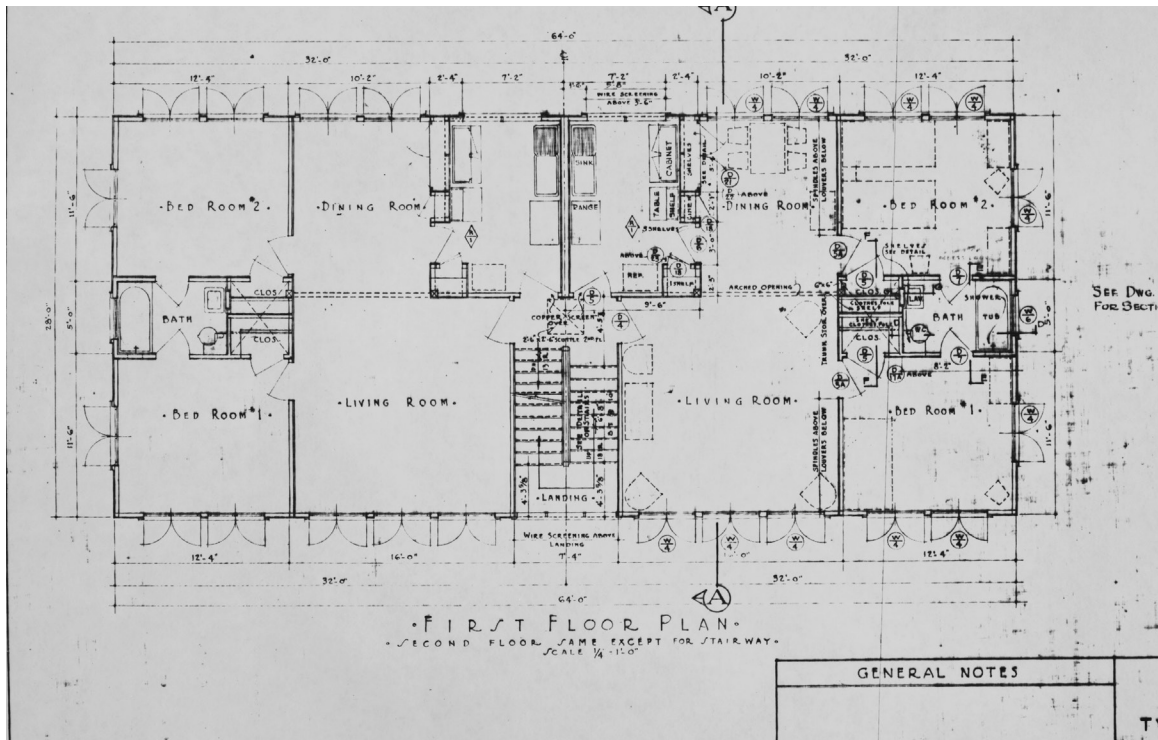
Four Apartments: Van Hook Place, First Floor Plan, Fort Amador, PCZ. Image courtesy of the Library of Congress.
